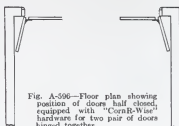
Floor plan showing position of doors half closed, equipped with "CornR-Wise" hardware for two pair of doors hinged together.
